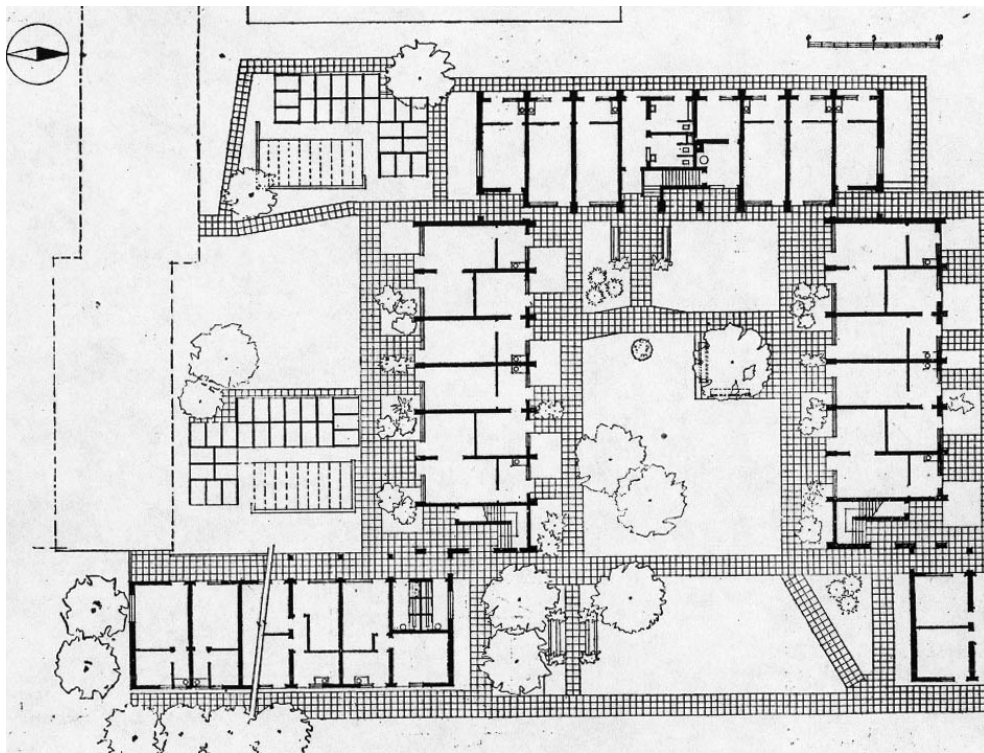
First Floor Plan, Youanmen residential block, Beijing, 1955, Hua Lanhong
